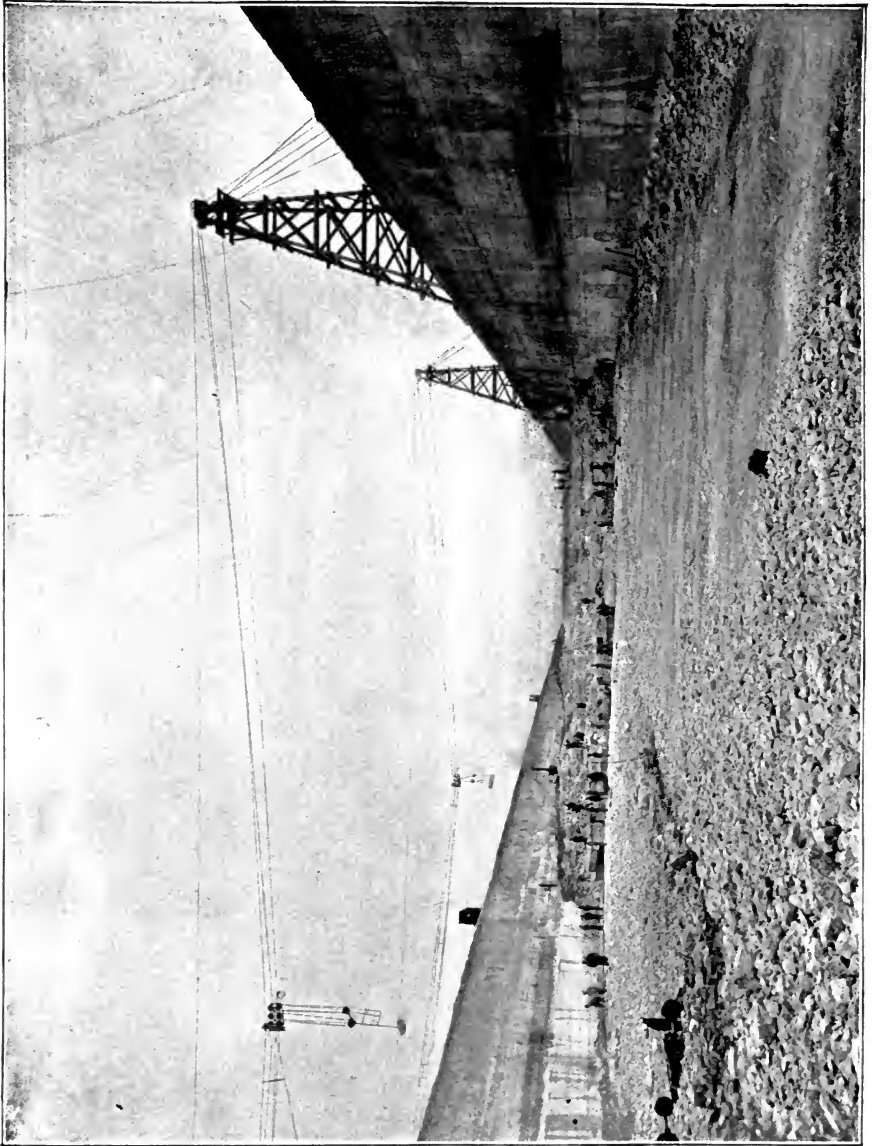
CHICAGO DRAINAGE CANAL: VIEW FROM THE BOTTOM OF COMPLETED ROCK CUT SHOWING TRAVELLING CABLEWAYS.
